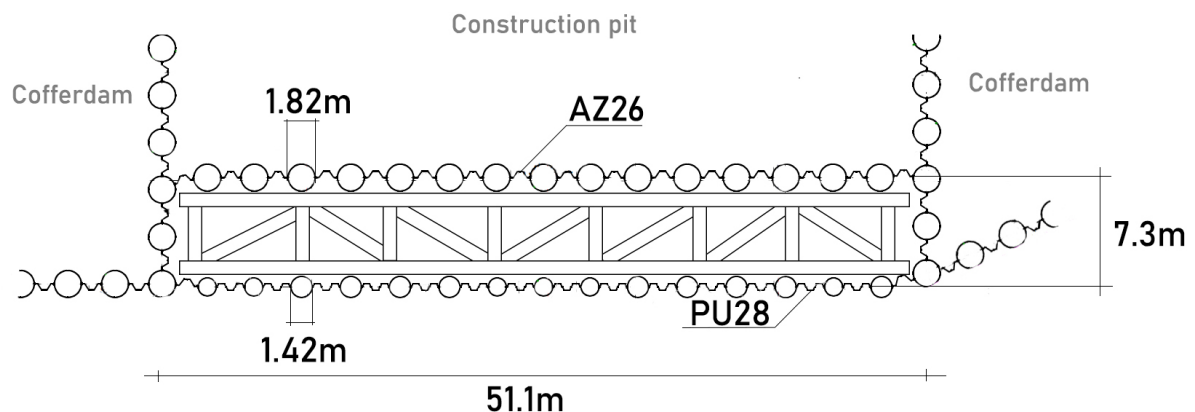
Dimensions of the end wall at the north side of the Scheur. Adapted from BAAK.
